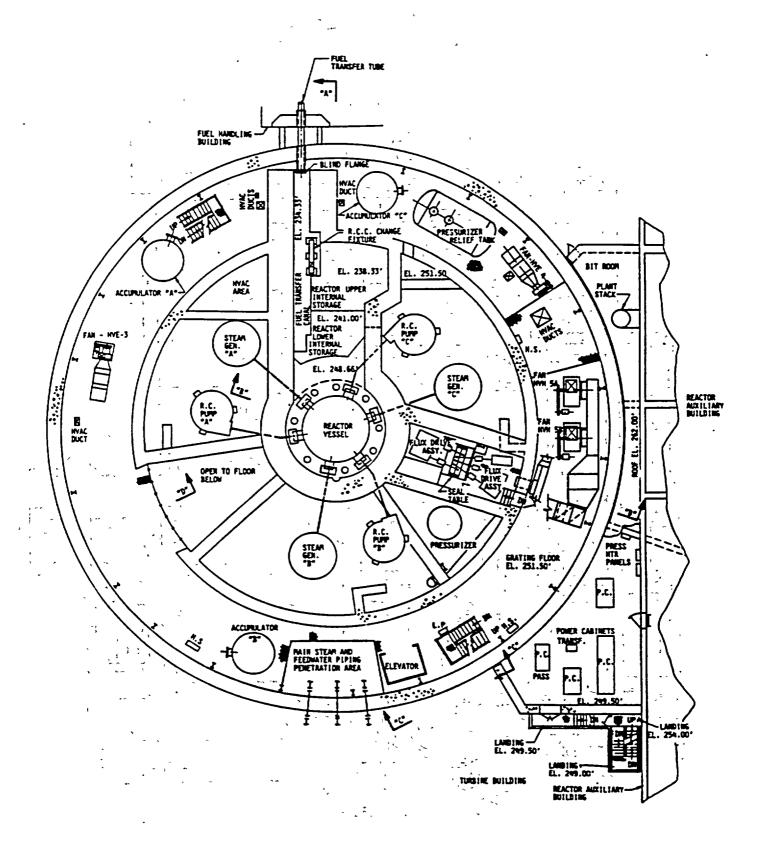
Plan View of the H.B. Robinson Large, Dry Containment (1-D Post-Tensioned Concrete)
